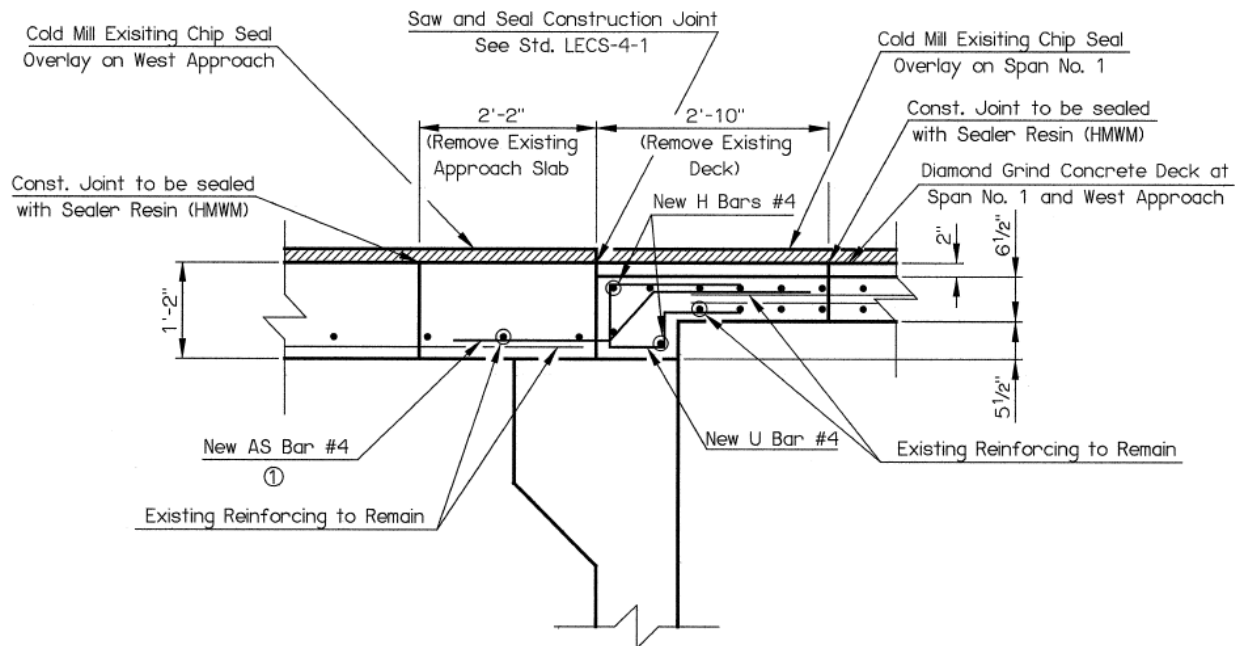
Details of rehabilitated construction joints at abutments for SH-3 north bridge over BNSF railroad
